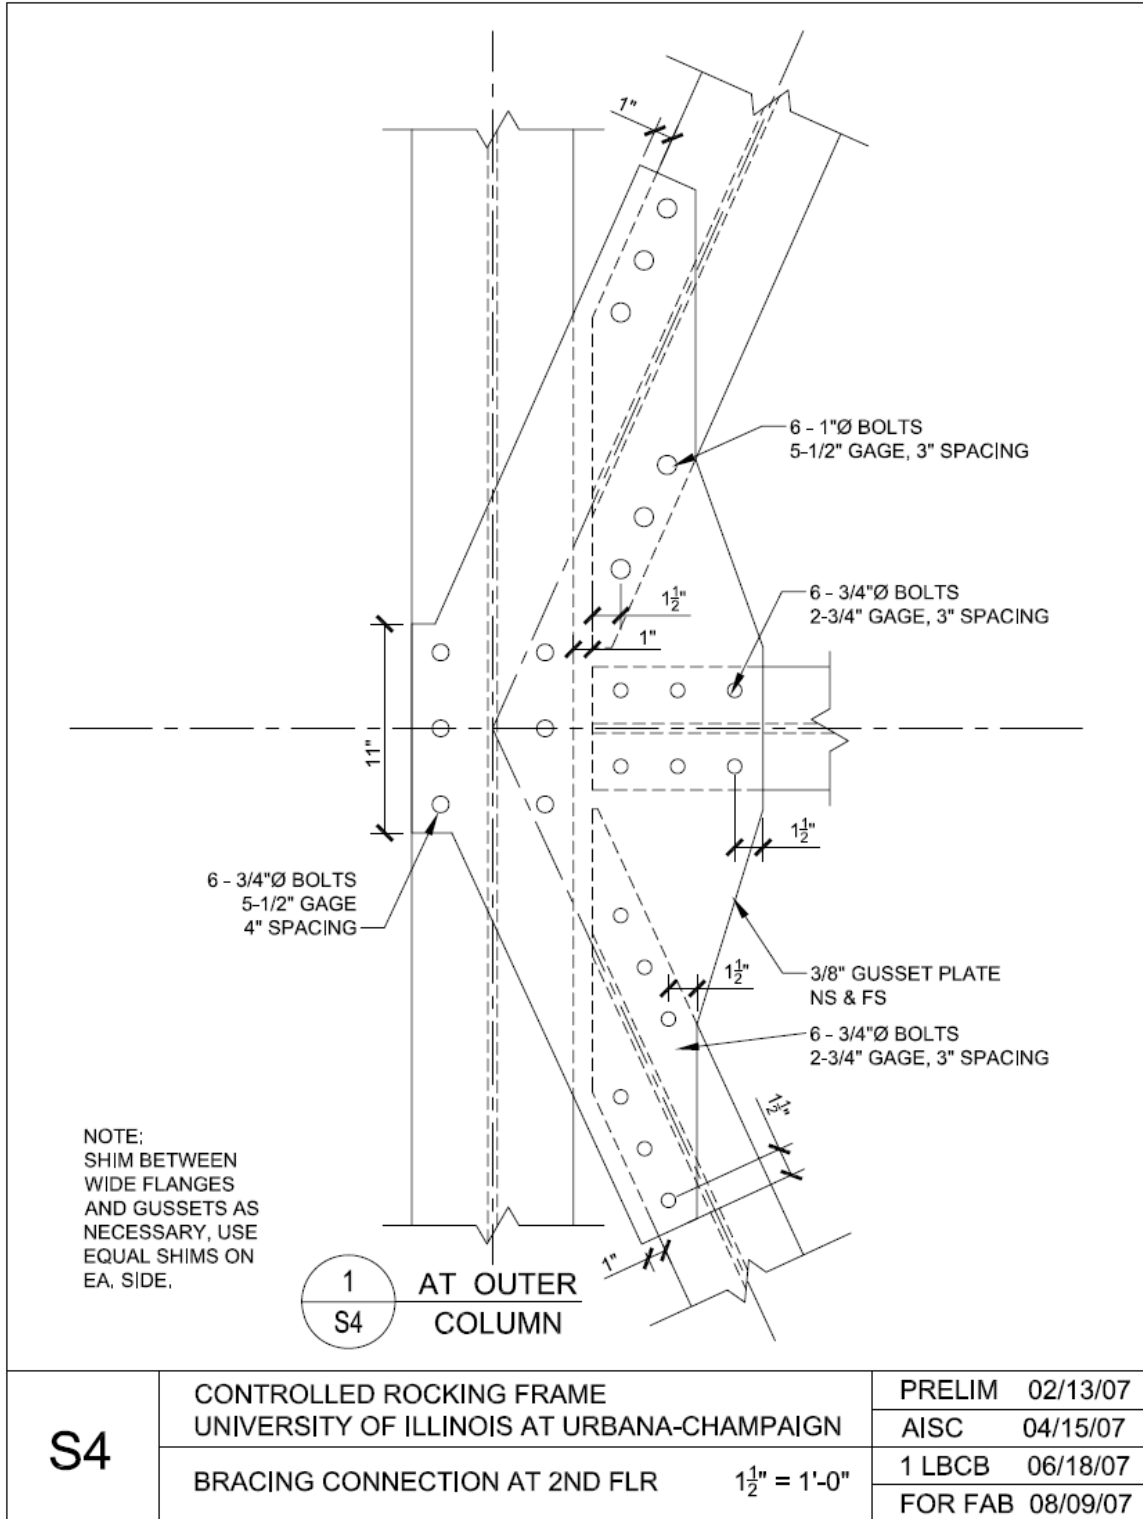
Specimen Design Drawing – Bracing Connection at 2nd Floor
